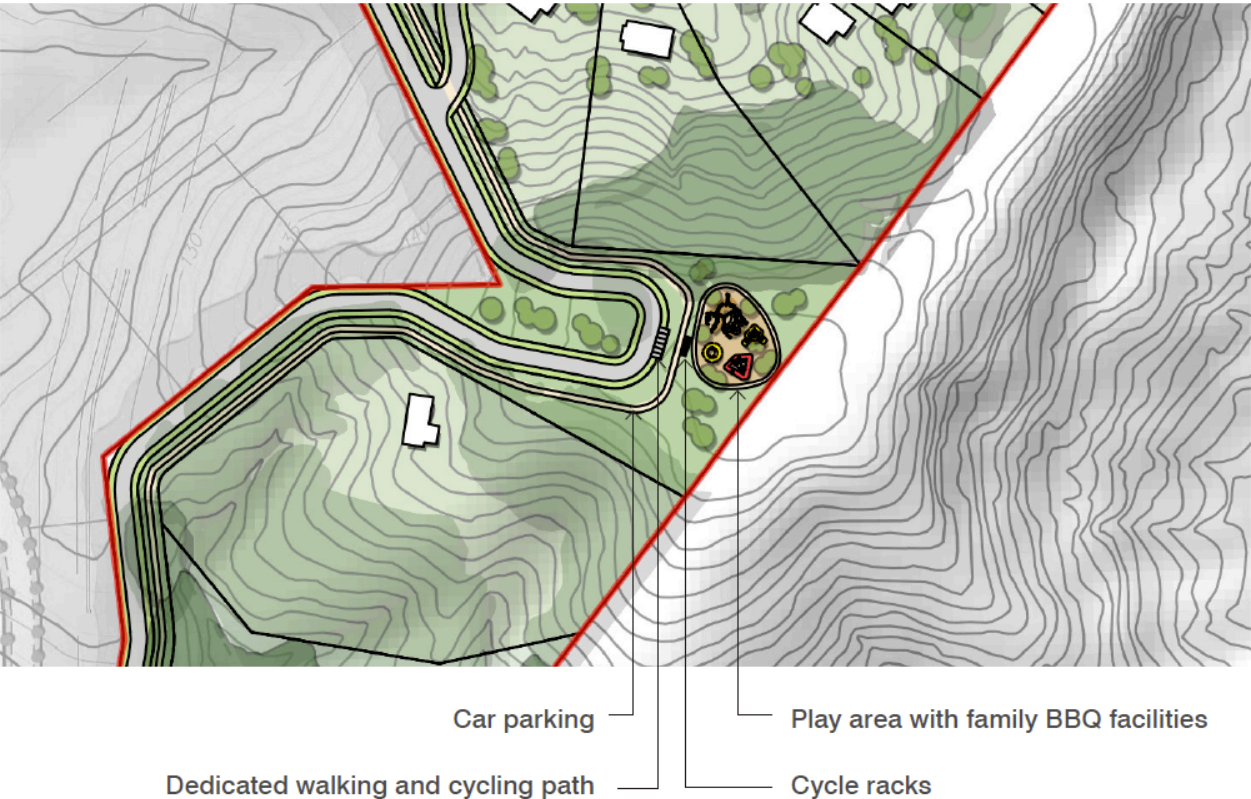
Open space concept plan – Lookout Park 1 (Source: Architectus)
